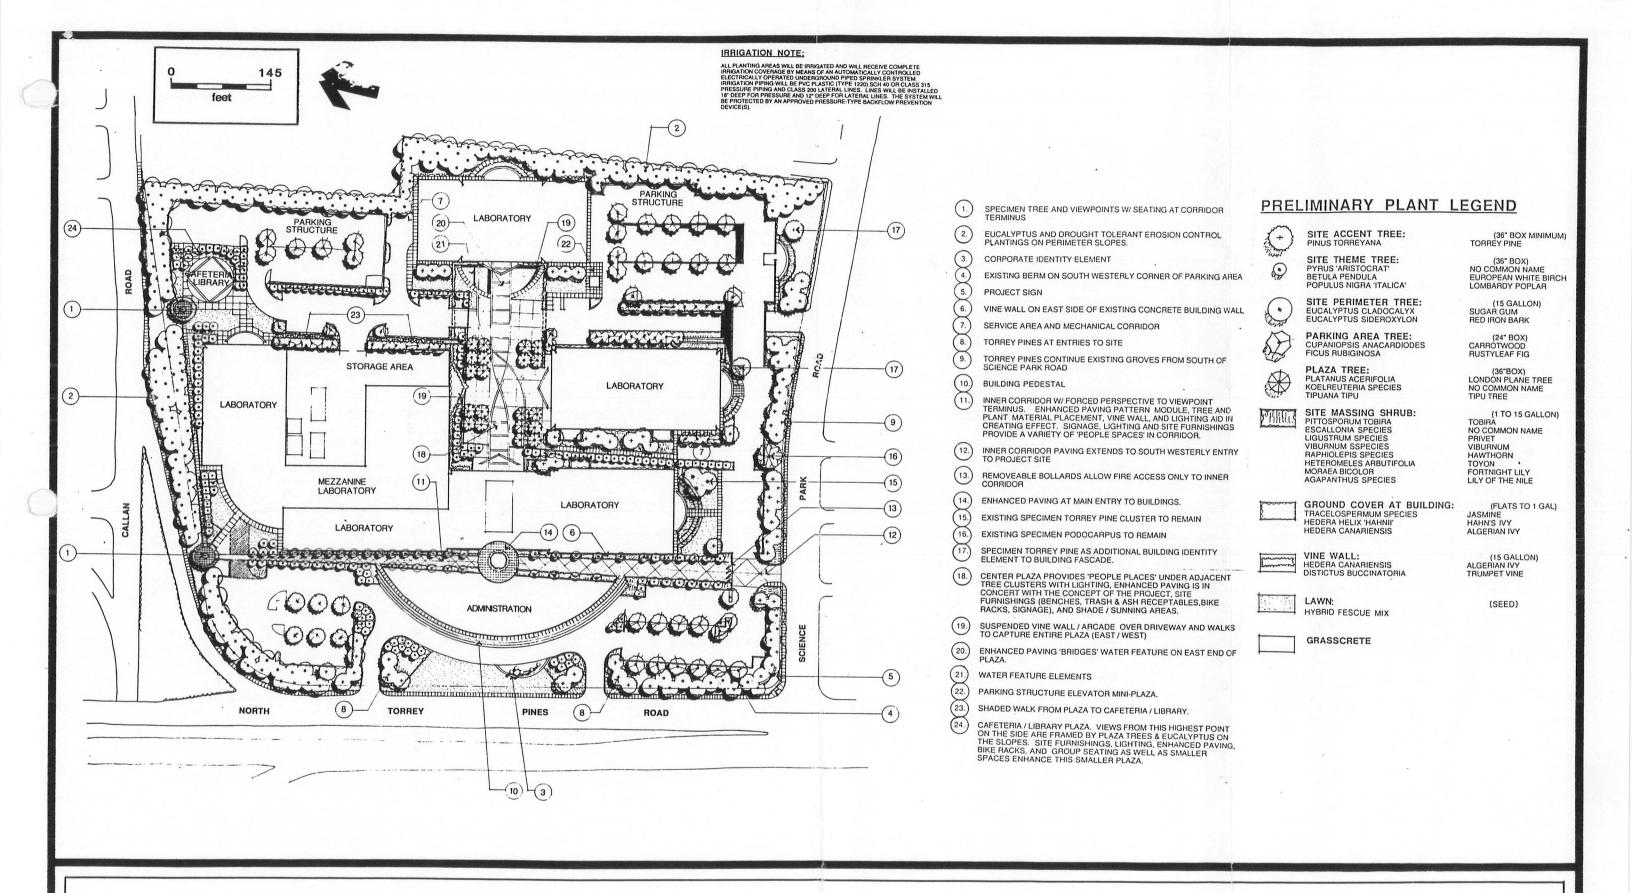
CONCEPTUAL LANDSCAPE PLAN
